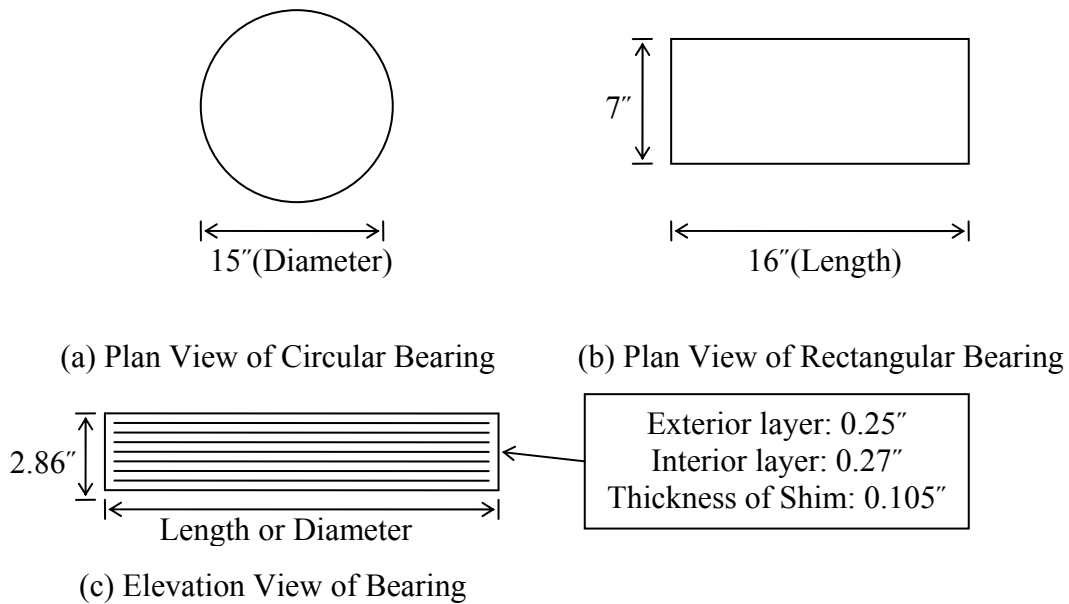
Dimensions of Elastomeric Bearing Pads Tested
